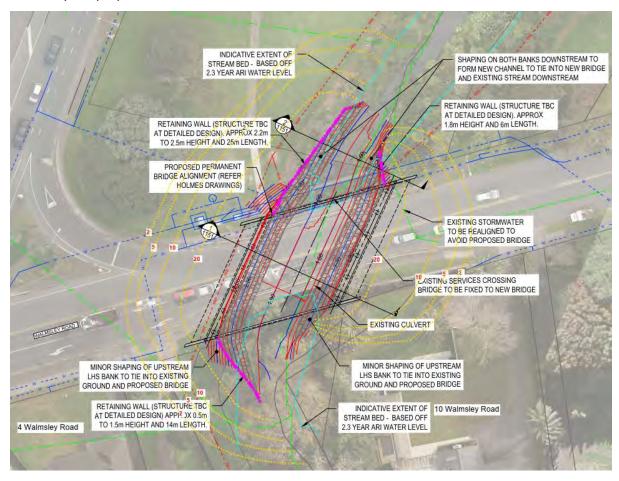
Figure Appendix D.4: Combined drawdown and mechanical settlement contours behind bridge abutments and retaining structures.
